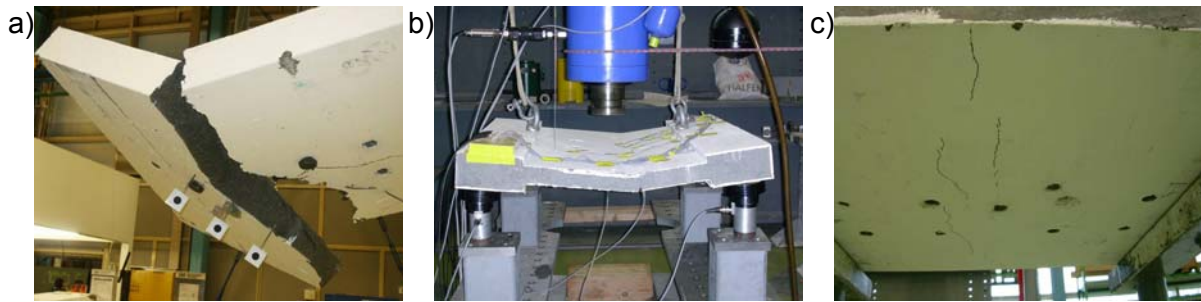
Specimens after the tests a) Falling weight , b) Actuator and c) Blasting test
